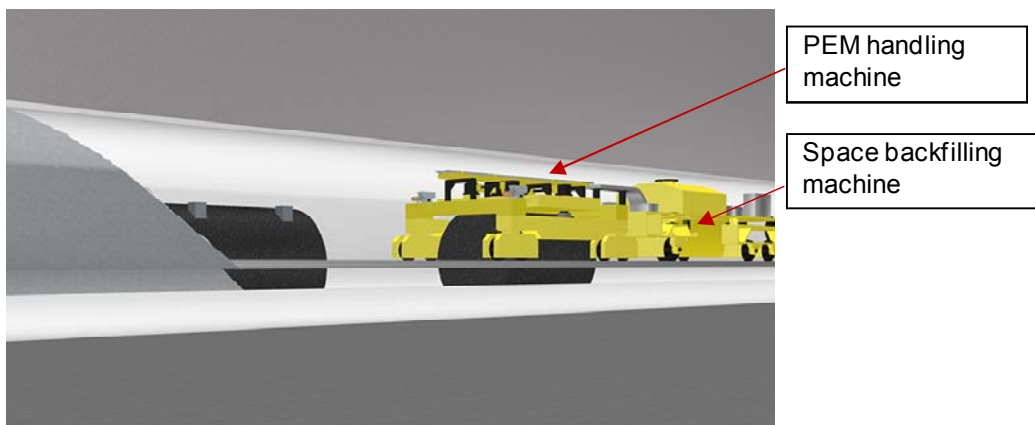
Emplacement option considering assumed underground conditions (horizontal emplacement/PEM type)
